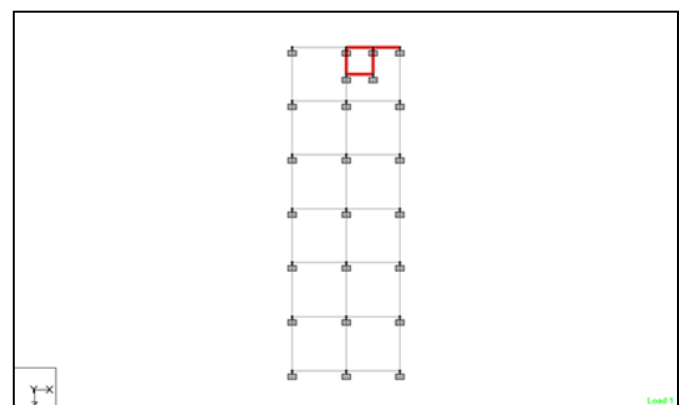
Plan view of structure with lift well as shear wall at back, model 2
